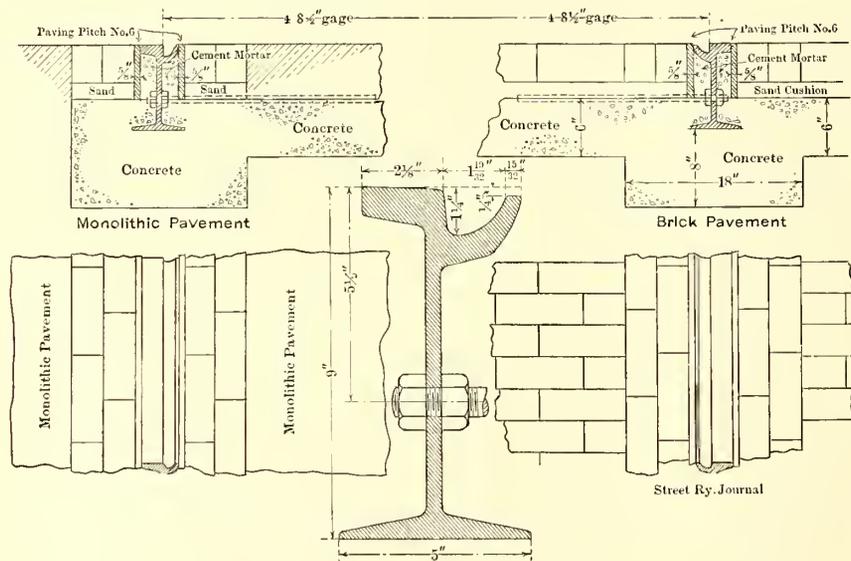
TYPE OF GUARD RAIL AND PAVEMENT CONSTRUCTION USED FOR PART OF THE KALAMAZOO LINES OF THE MICHIGAN TRACTION COMPANY
